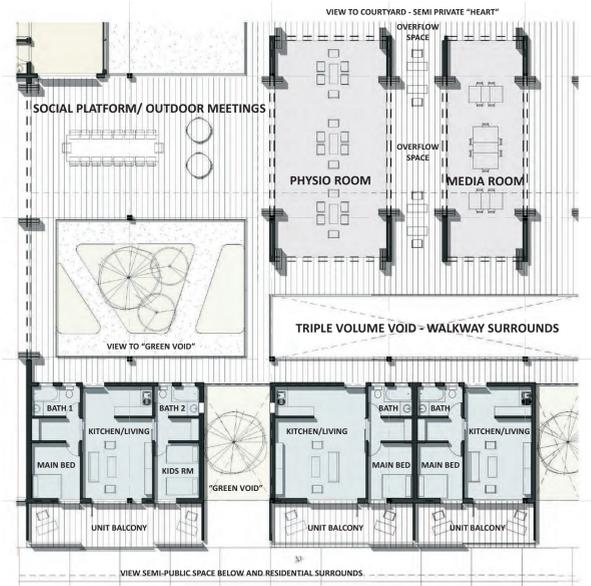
DETAIL PLAN OF GROUND FLOOR OUTPATIENTS THERAPY
